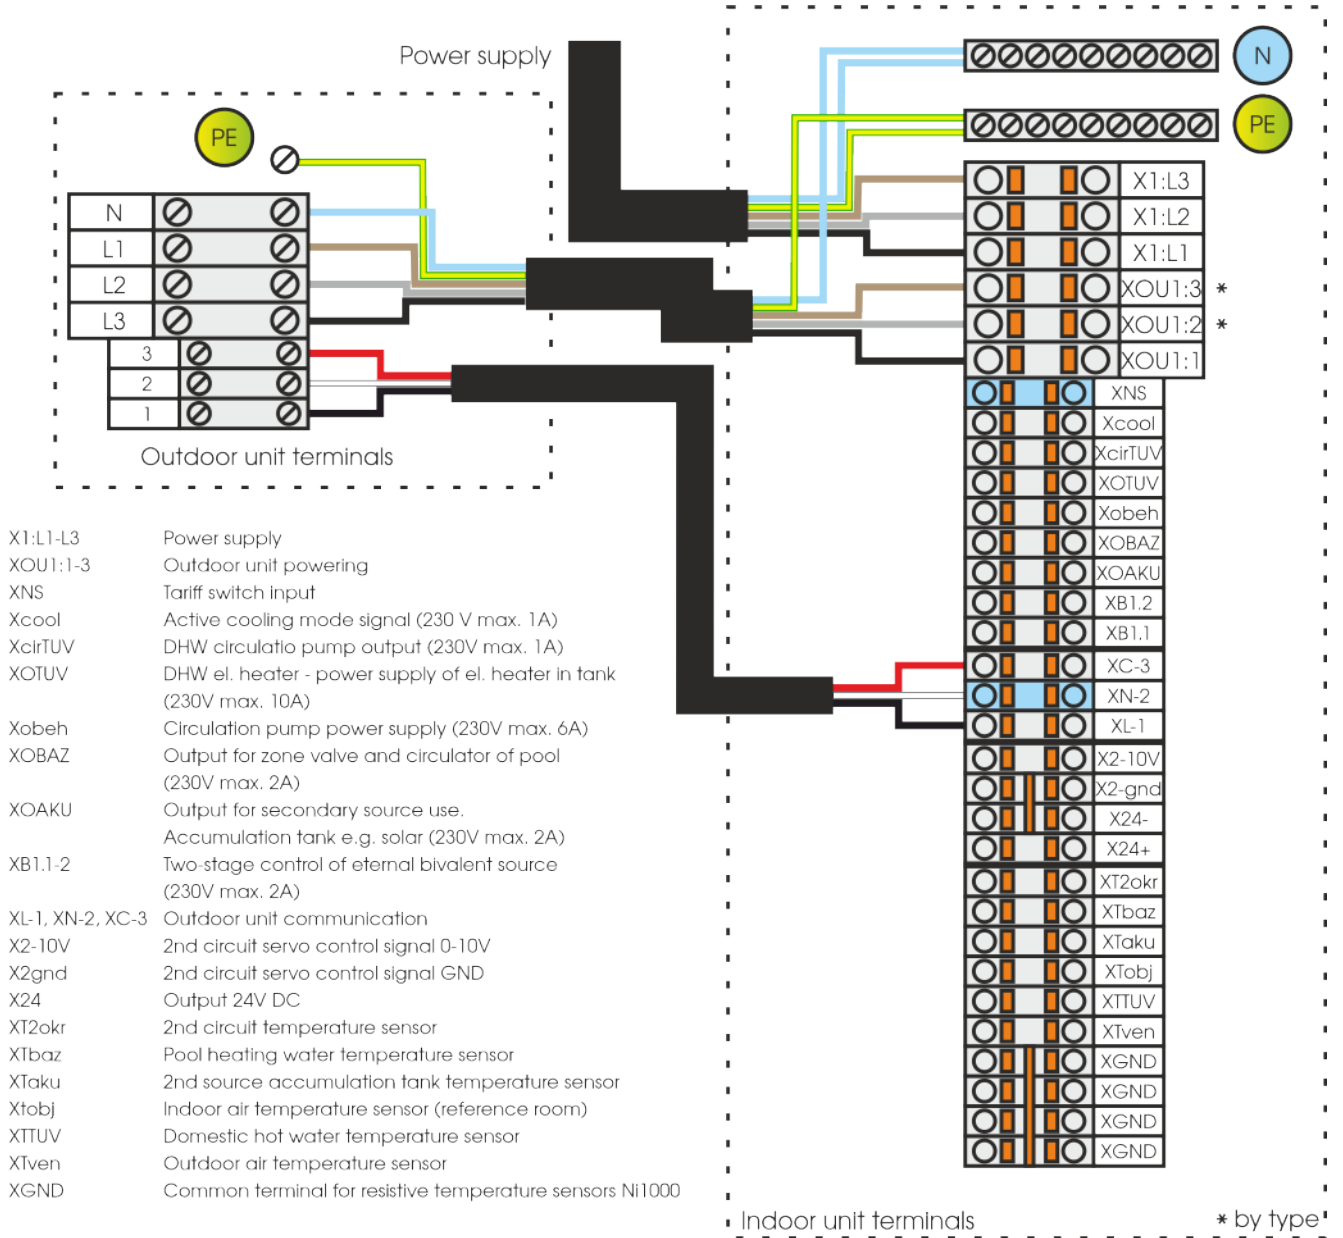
The terminal block of indoor and outdoor units and their connection
